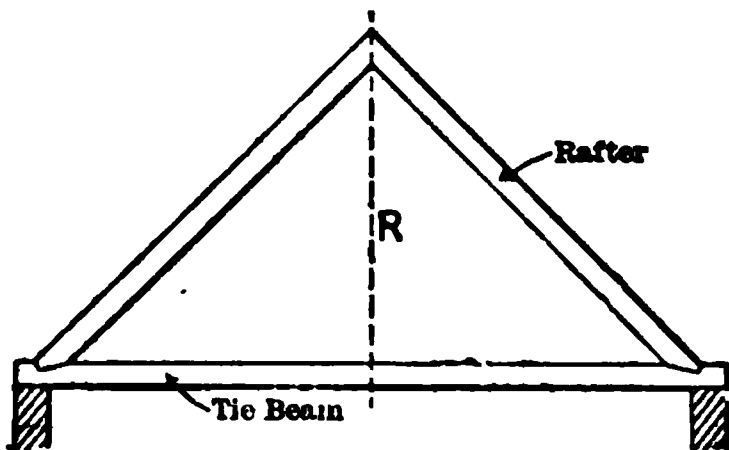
Simplest Three-piece Truss. Spans up to Twenty-four Feet
